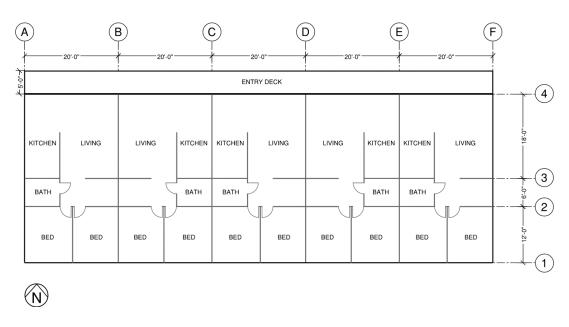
Second- and third-story plan of the design example long-side-open building.
